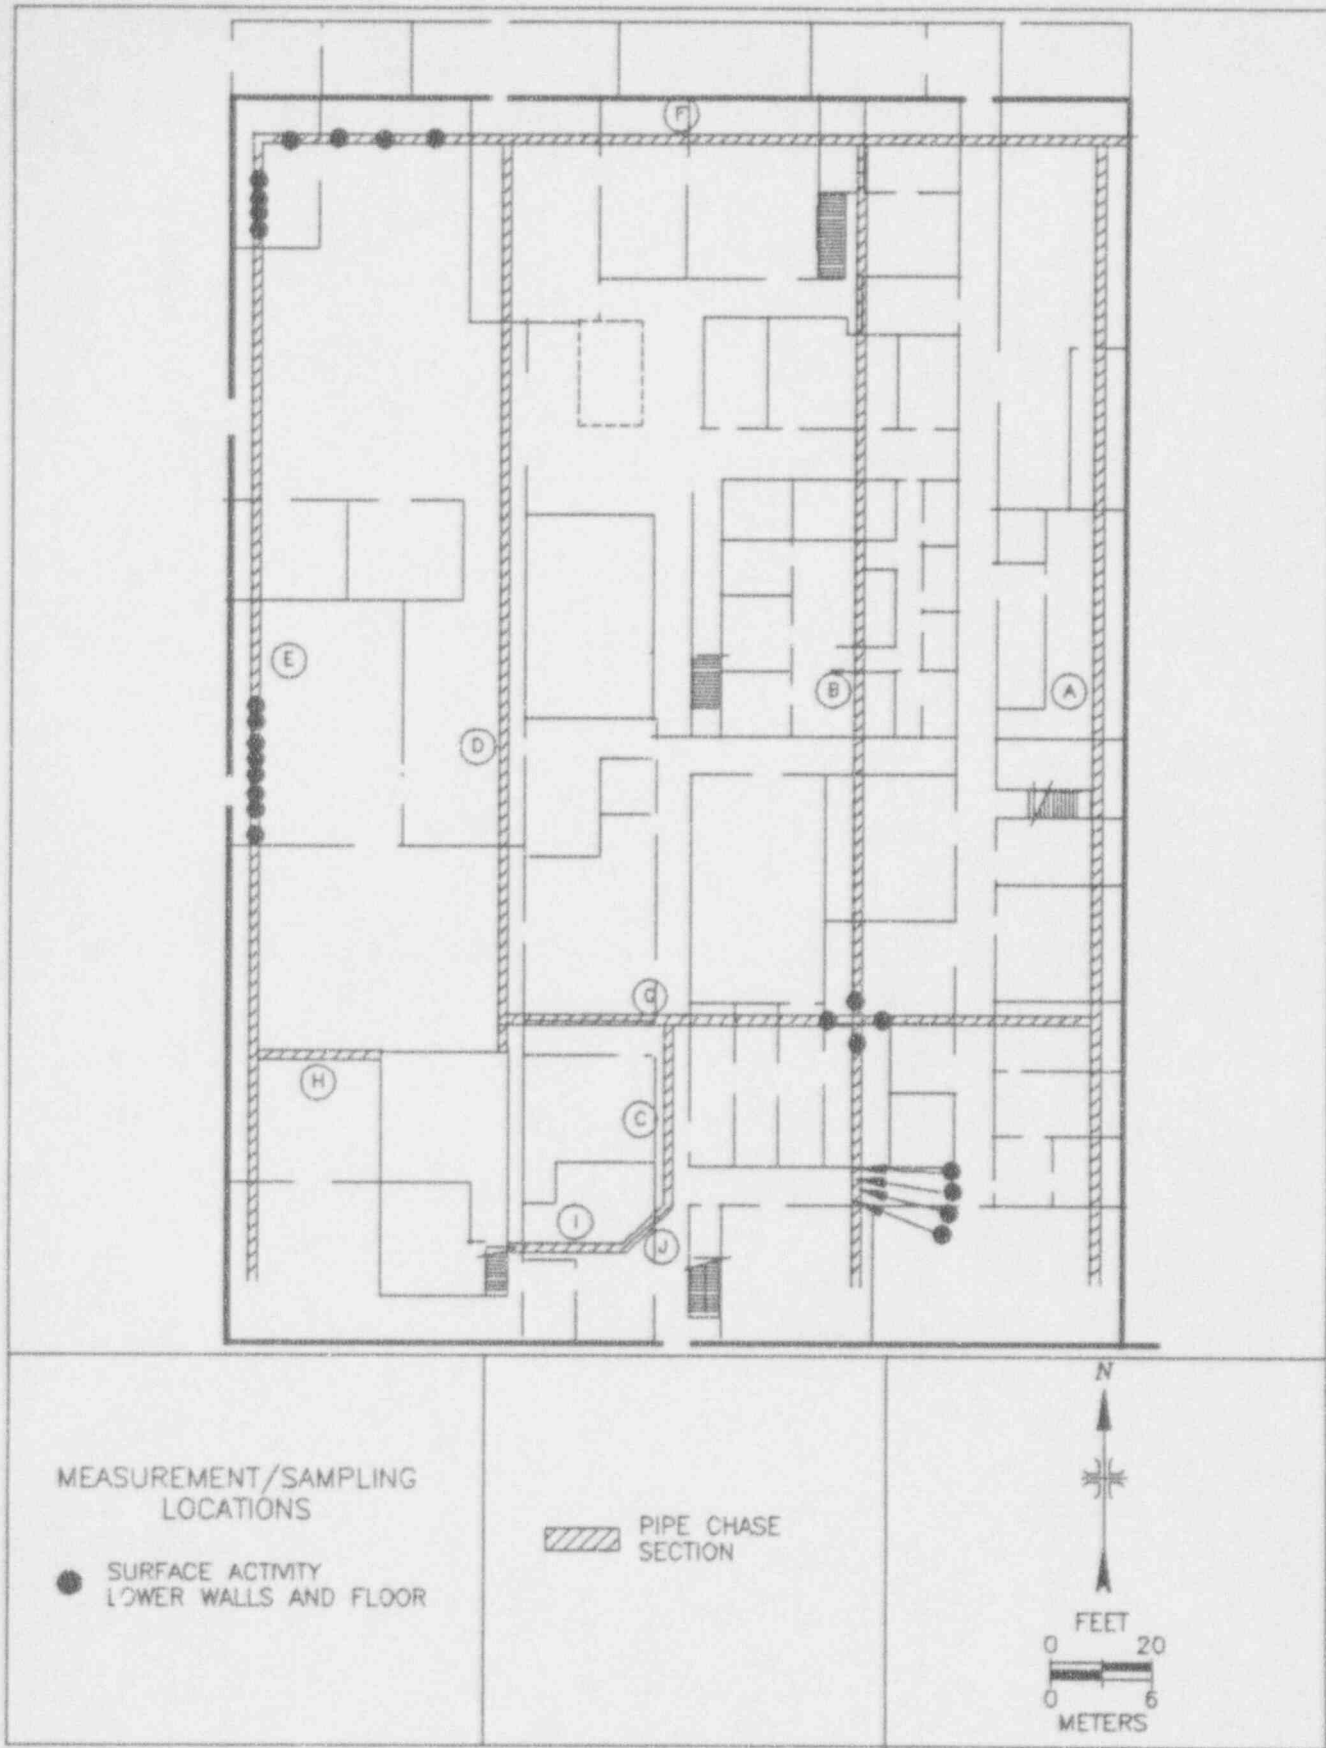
Building 9, First Floor Pipe Chases – Measurement and Sampling Locations
